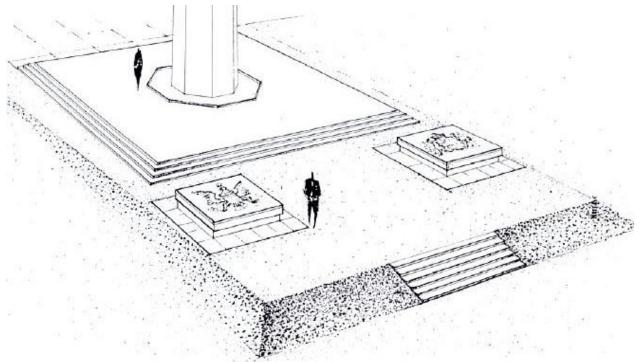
Sketch of proposed re-arrangement of podium, c1964–65 plans. (Source: CPR 2009)
